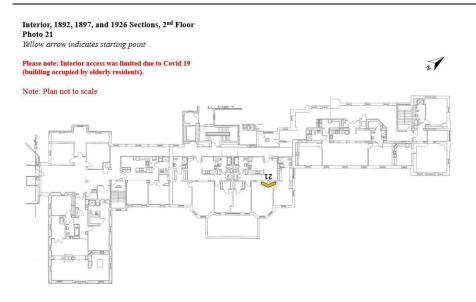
Interior, 1892, 1897, 1926 Sections, 2nd Floor Photo Key (Photo 21)
